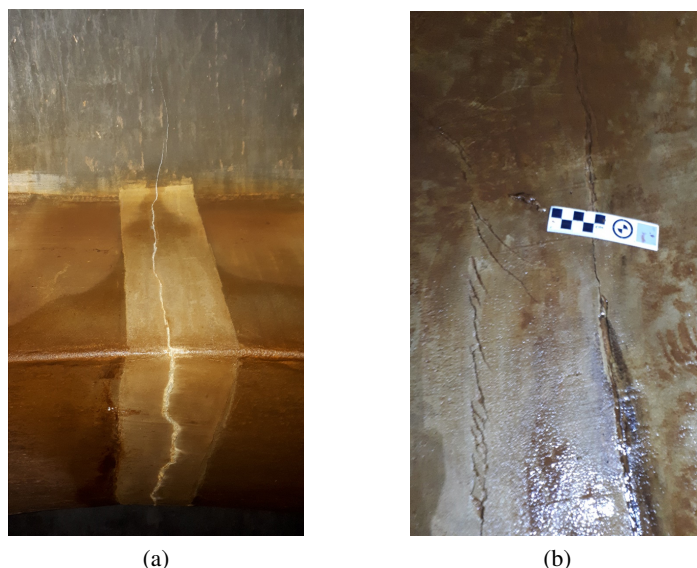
(a) Bottom plate in chamber I, slanting cracks, locally with crushed material and branching, opening width ca. 0.9 mm; (b) binding joist in the H-G/8 axis in chamber I – a horizontal crack in the repair area, with efflorescence, opening < 0.3 mm, running vertically towards the vault (photo by T. Godlewski)
